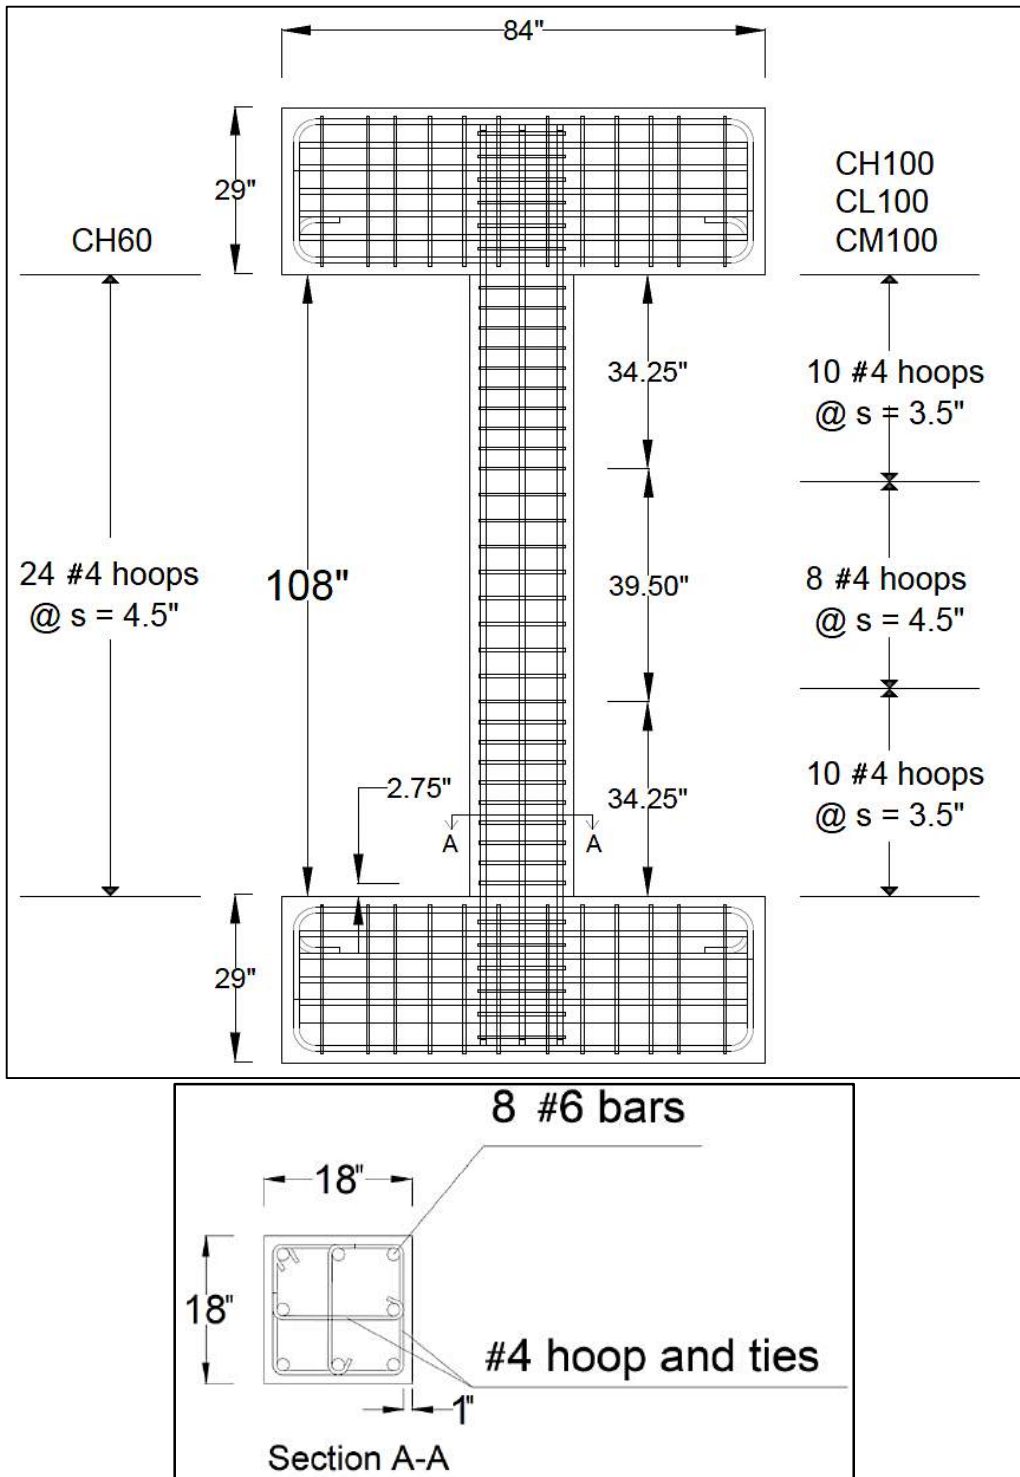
Elevation and cross-sectional view of the reinforcement in columns
